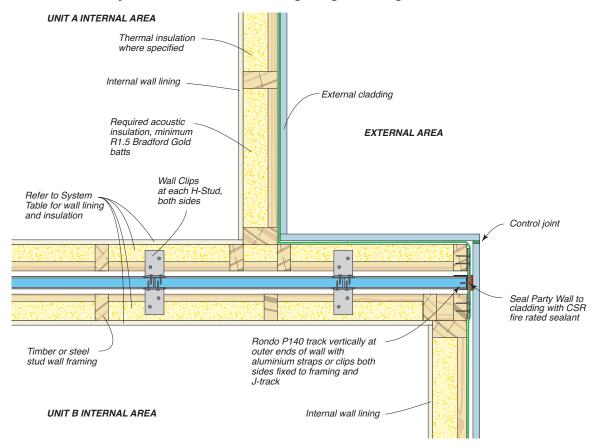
Junction Of Party Wall And External Wall With Lightweight Cladding At Wall Return - Cavity System - Plan View
